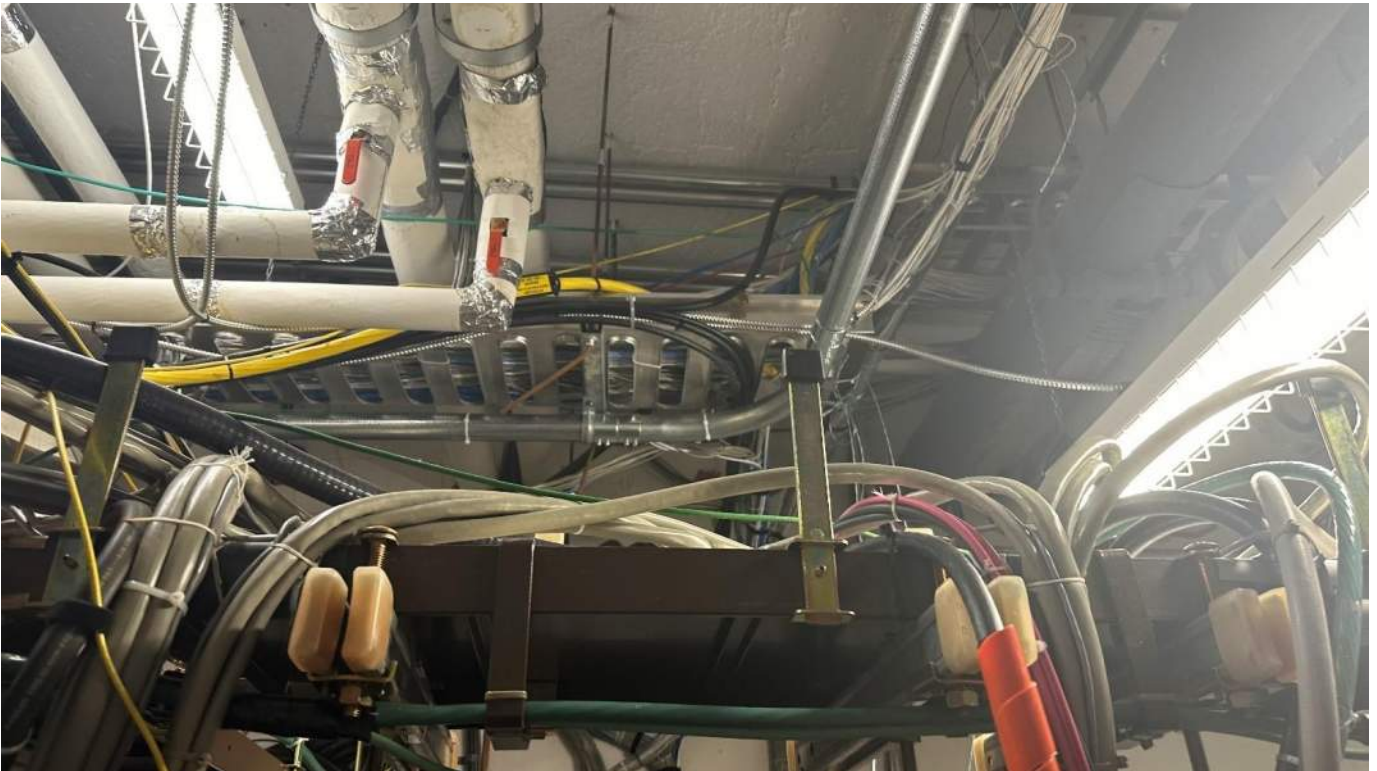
Brooke Claxton Building – IT Room Cabling Condition (2)
